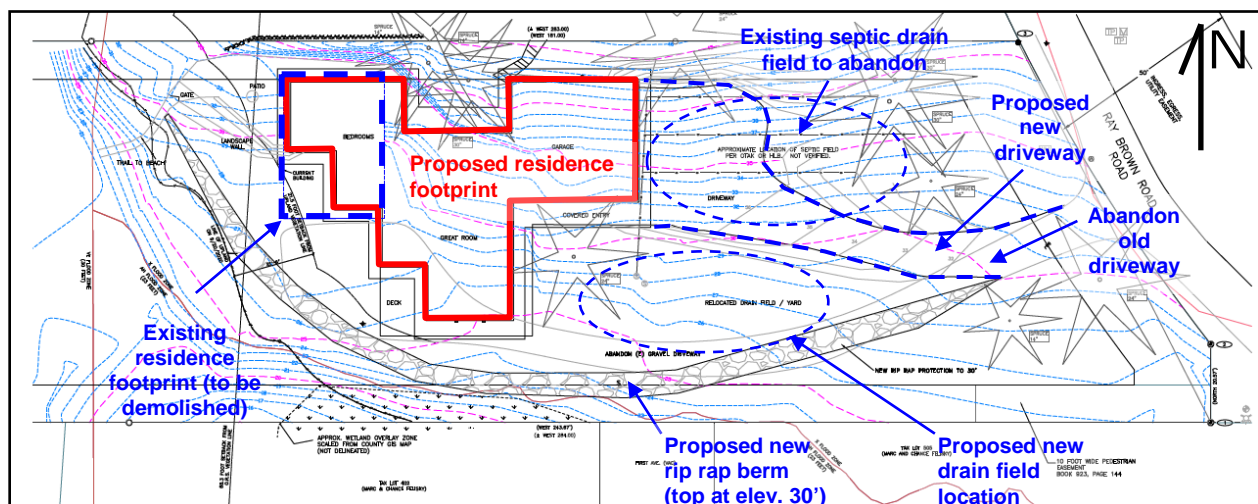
Site Plan provided on Sheet A1 of the drawing set referenced above.
